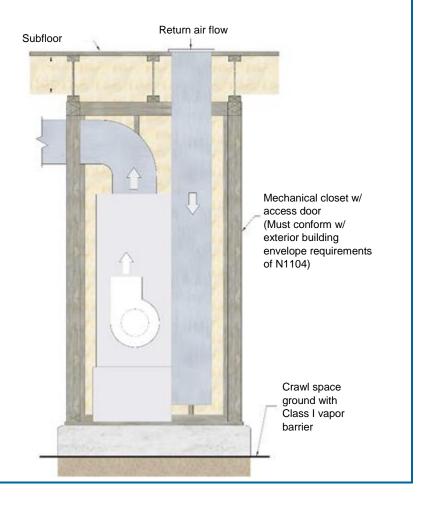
For buried ducts to be considered inside conditioned space, the air handler must be installed inside conditioned space. This practice typically requires constructing a mechanical closet below the floor plane.
